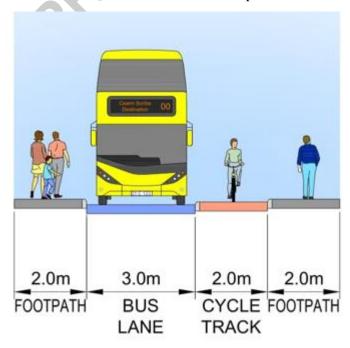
Section 2, Proposed Option 4 – Cross Section A-A
